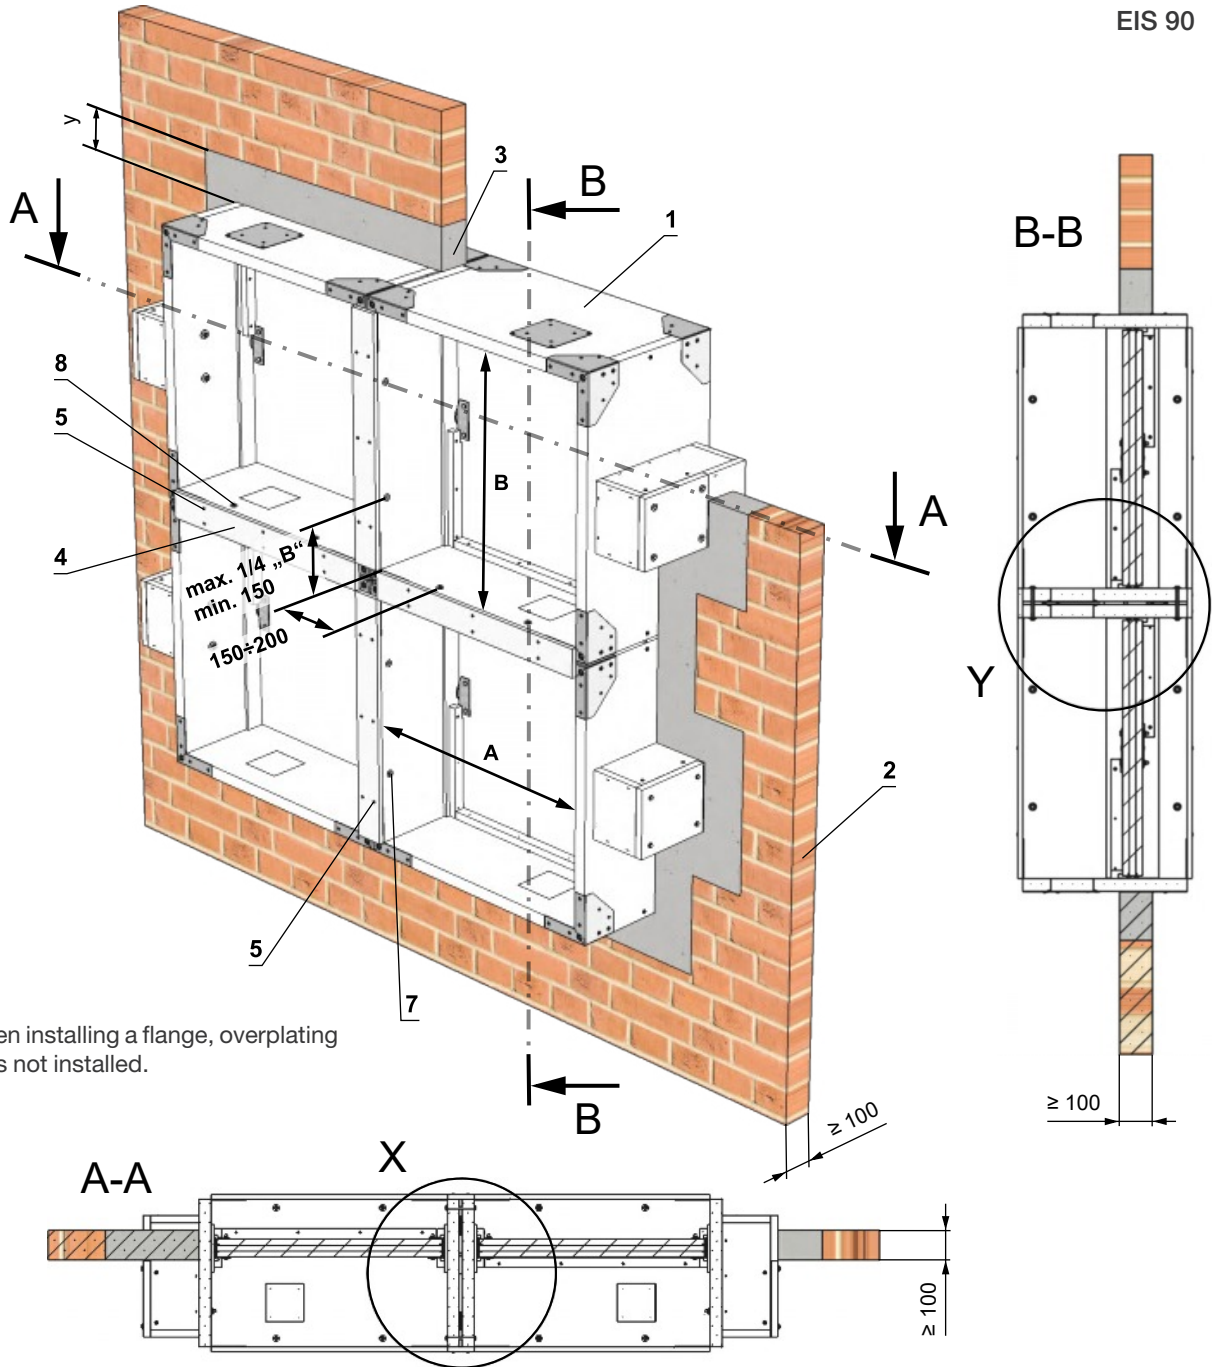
4 dampers - solid wall construction - mortar or gypsum
